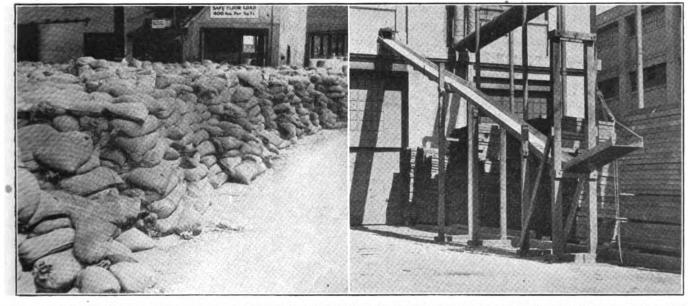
THE SECOND FLOOR OF THE PIER MAKES A CONVENIENT STORAGE SPACE FOR CEMENT—ABOUT \$00,000 BAGS ARE CONSTANTLY ON HAND—FIG. 4 (AT RIGHT) SHOWS ONE OF THE ZINC LINED CHUTES FOR QUICK LOADING OF TRUCKS FROM STORAGE AT A COST OF LESS THAN 2.00 CENTS PER BAG
